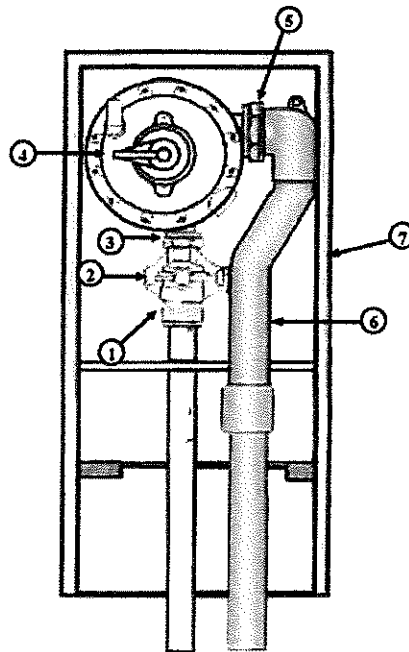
Indicative configuration of a low-pressure regulator installed in a box. The protective box shall be properly constructed to permit an alternative outlet from the right side view of the box.
